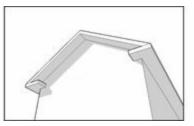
If your gabled roof is part of a larger roof structure, it may just run into another roof pitch. Let it.
